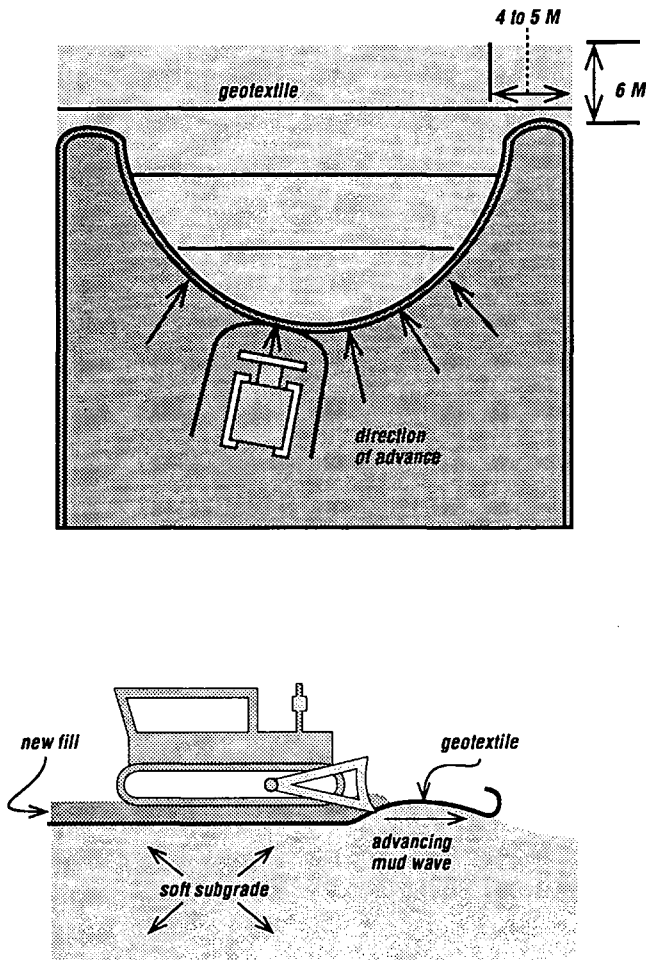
Reinforced fill construction method if mudwave forms (1): top, plan; bottom, mudwave formation during fill placement.
